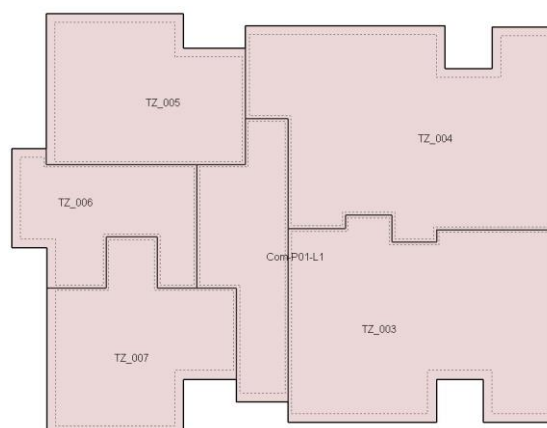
Thermal zone definition on floor 1 (6D L1 building of the Stepa Stepanovic neighborhood)
